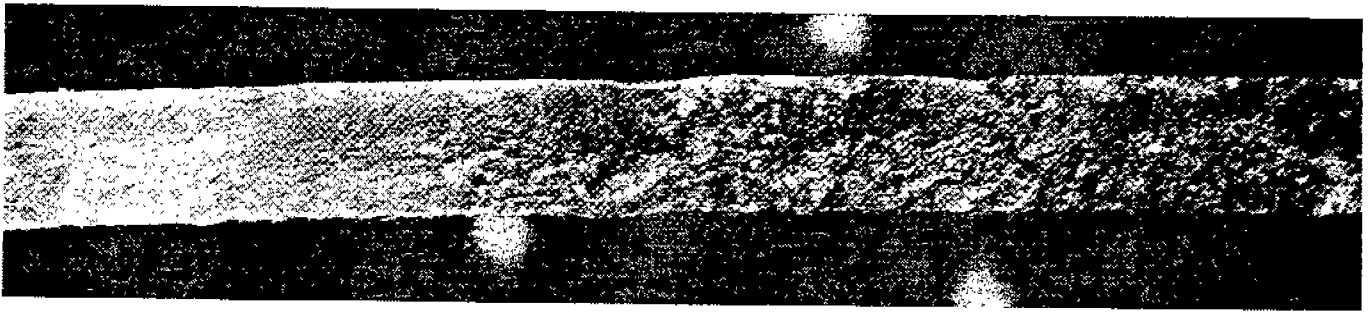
Fracture face of deck plate. This is typical of ductile type fracture.
